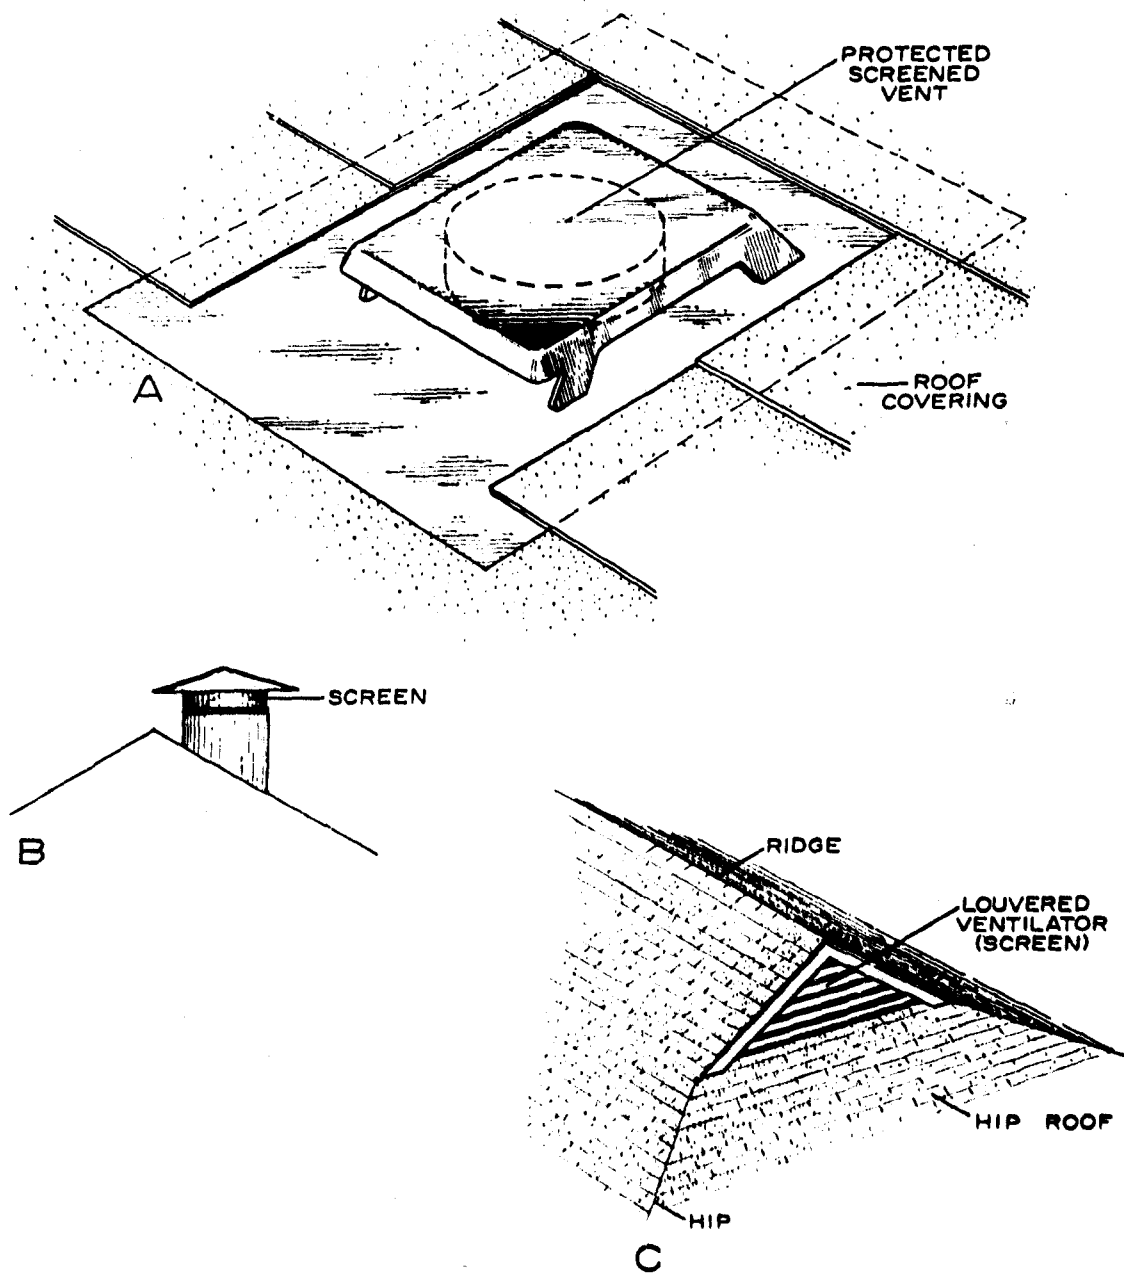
Ridge outlet ventilators: A, Low silhouette type; B, pipe ventilator type; C, modified hip ventilator. M 139 217
